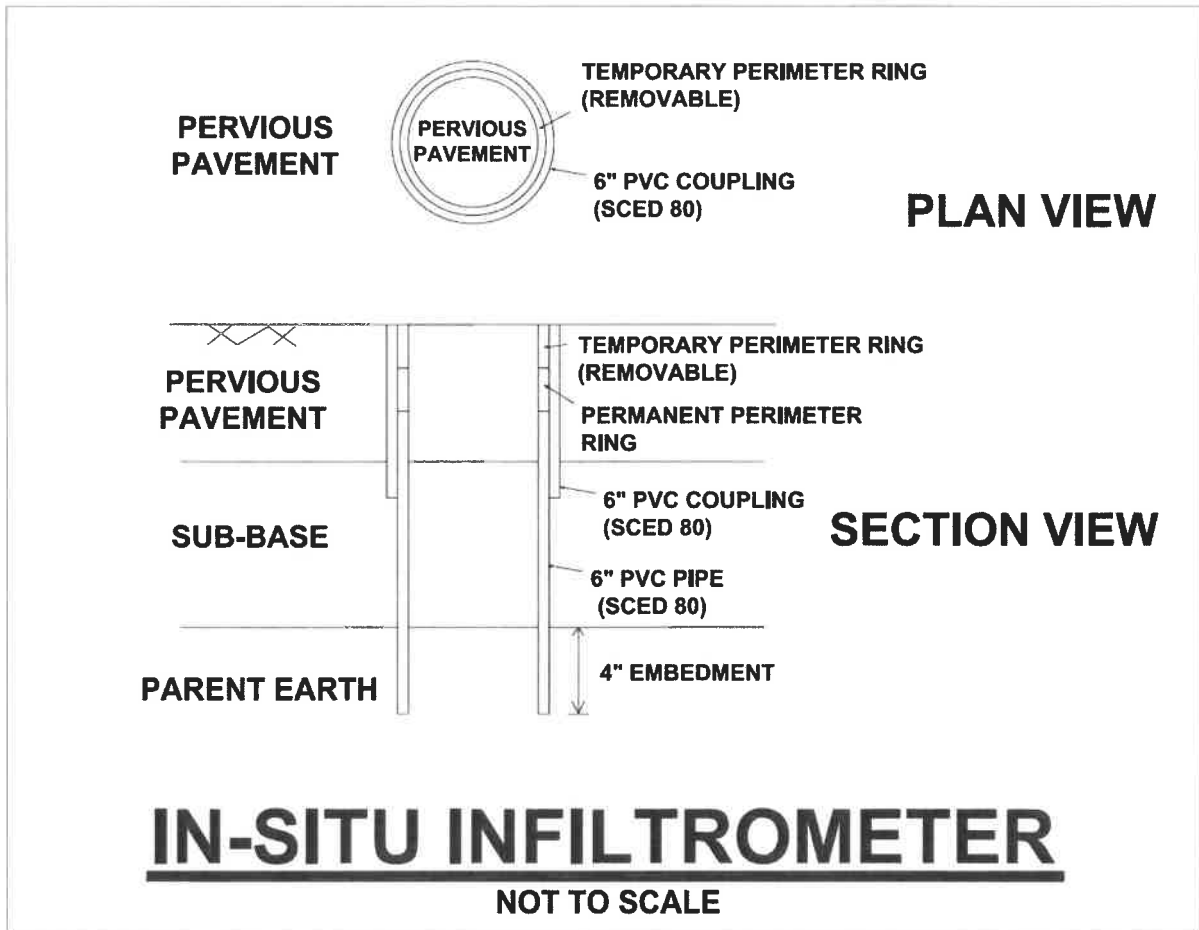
Plan View of ERIK In-Situ Infiltrrometer - (Embedded Ring Infiltration Kit).
